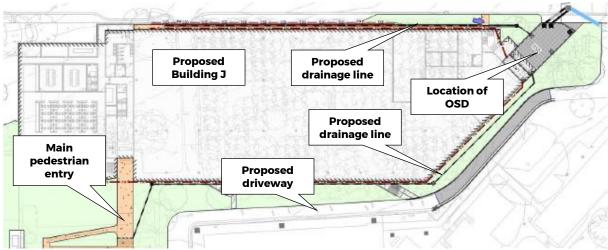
Proposed OSD & Rainwater Tank Location Source: Northrop Consulting Engineers
